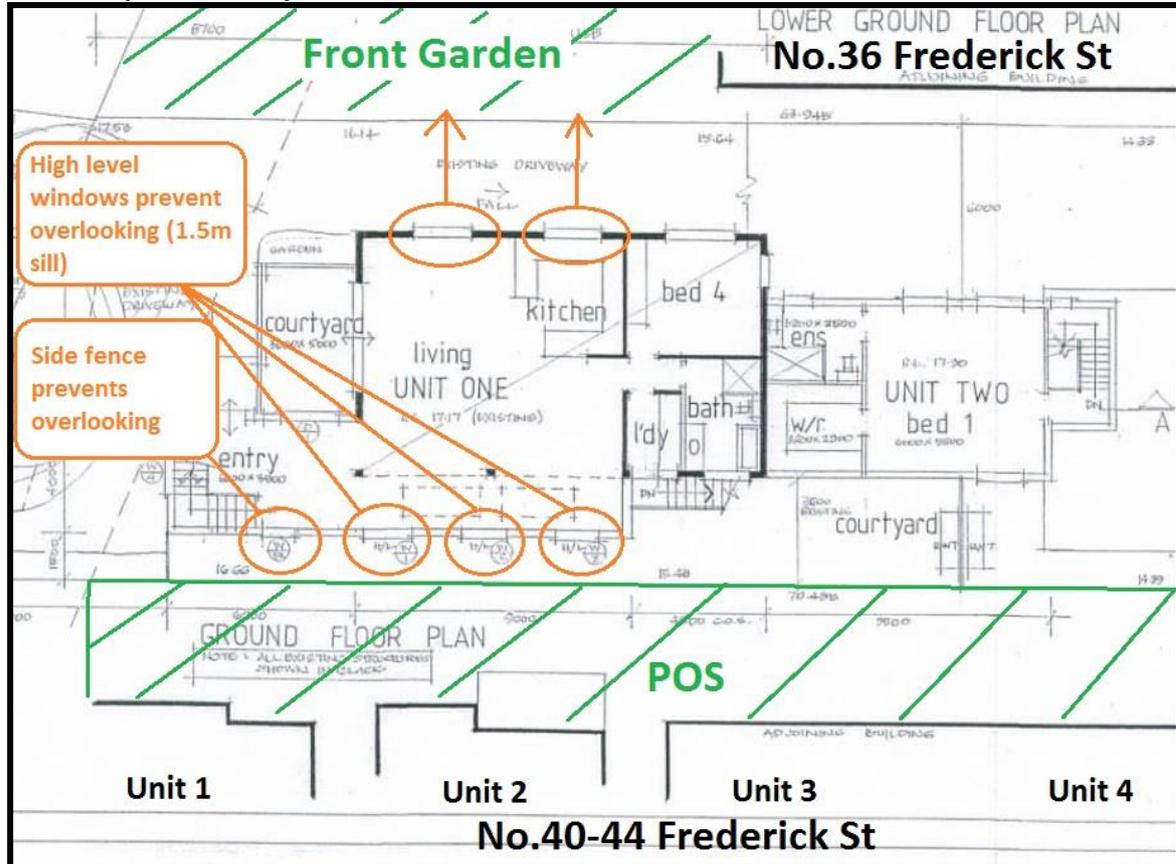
Ground floor plan diagram indicating how privacy is maintained from the Dwelling 1 ground floor living room windows. The side fencing and the proposed high level windows prevent overlooking on the southern side. To the north, the windows will only be able to minimally overlook the front garden of No. 36 Frederick Street which is not considered to be a significant privacy concern.
